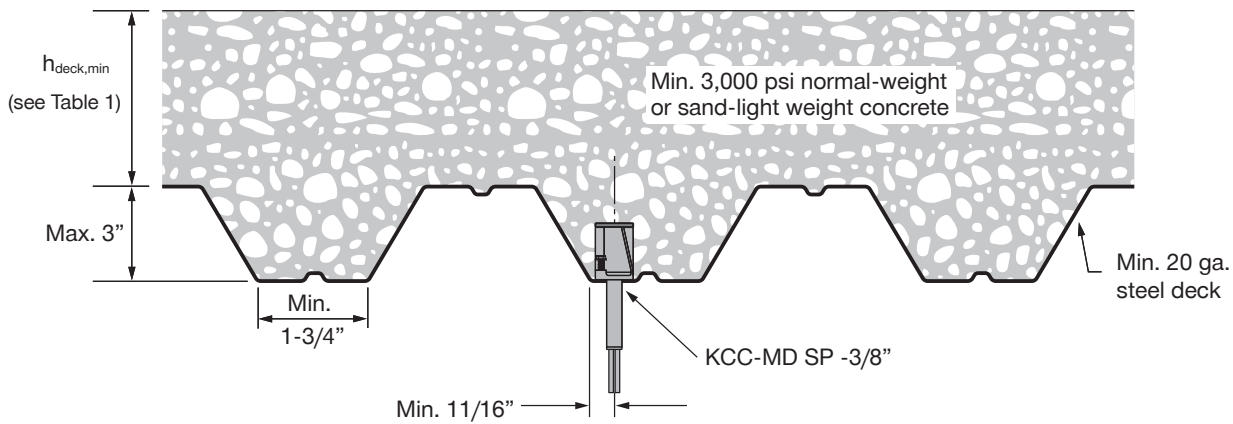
B — Installation of KCC-MD inserts in the soffit of concrete filled metal deck floor and roof assemblies-over lower flute (W-deck)
